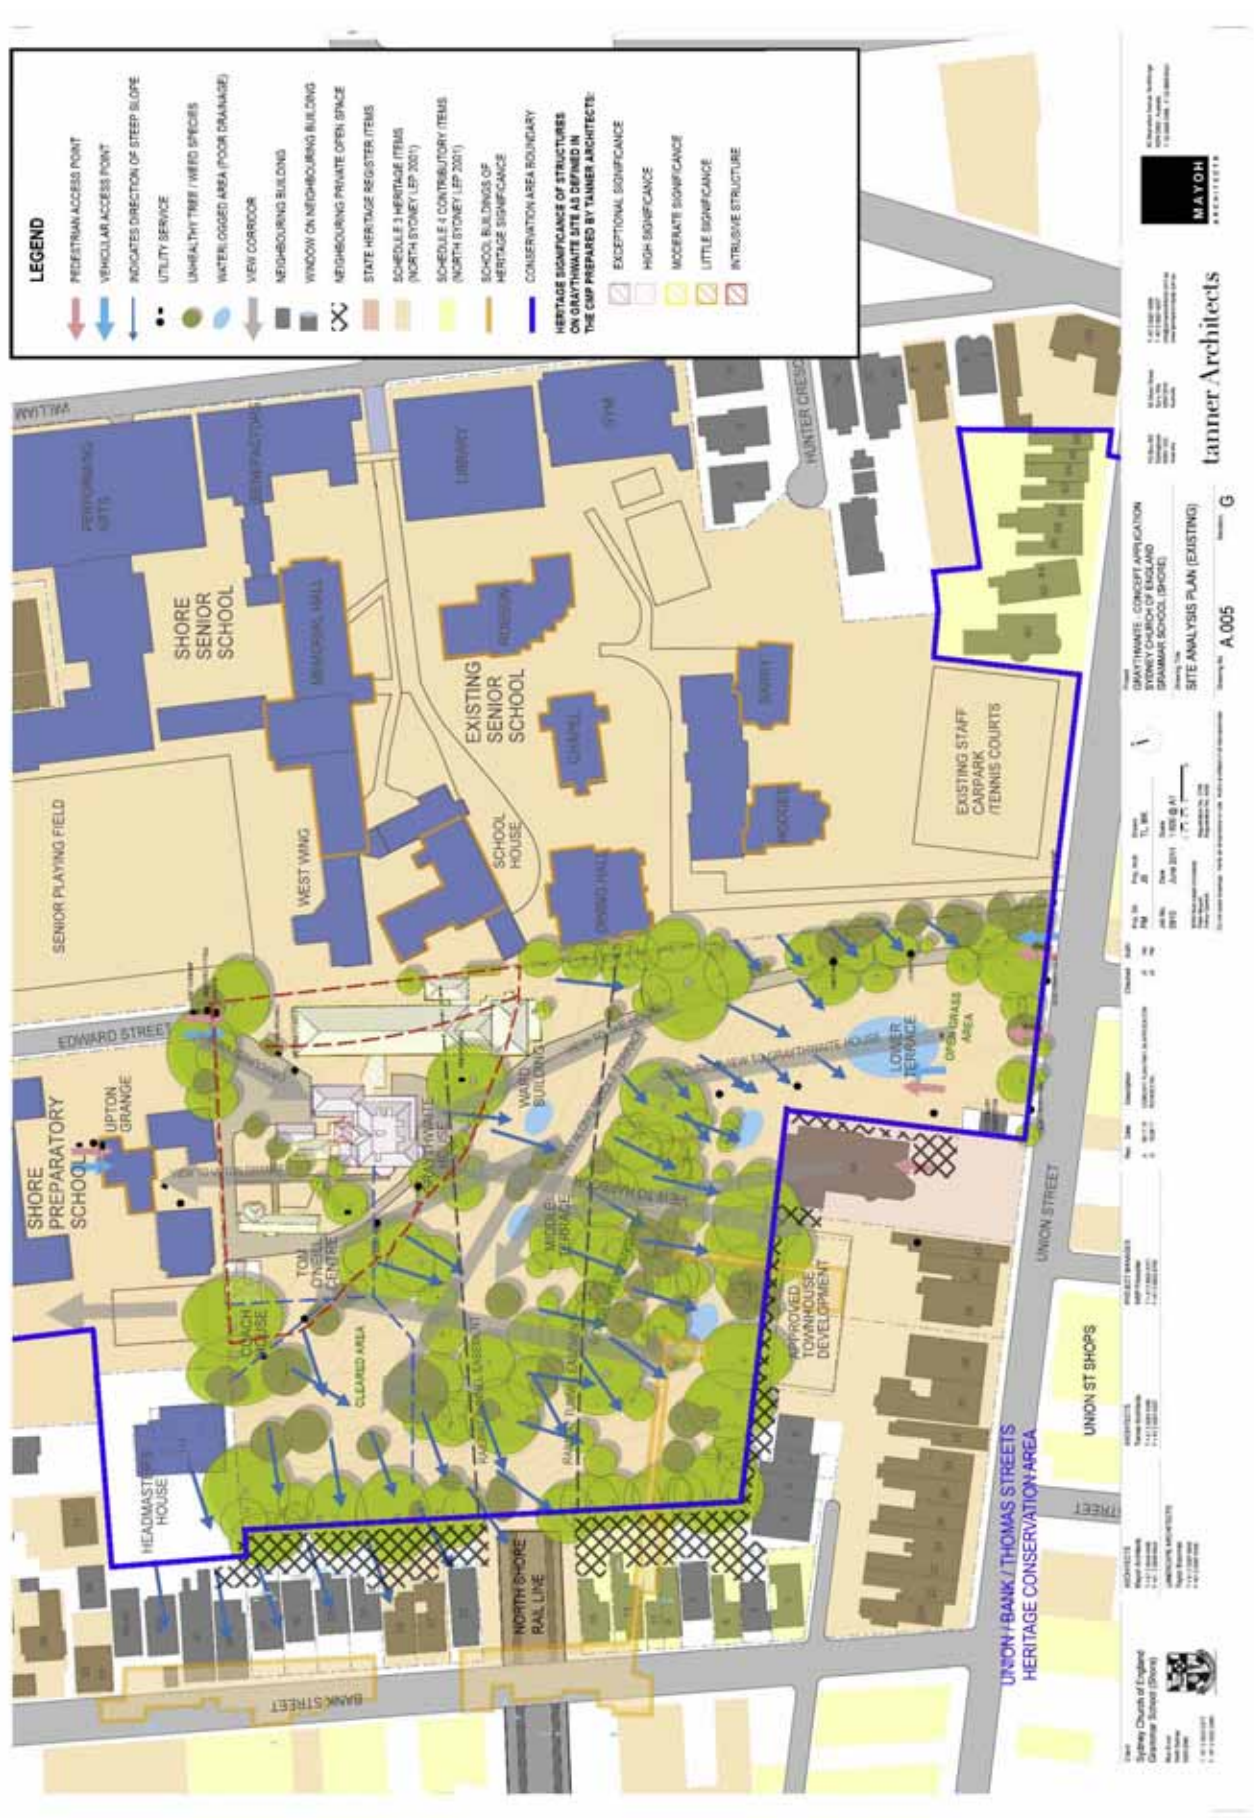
Site analysis plan. Not to scale. (Source: P.A Mayoh)
